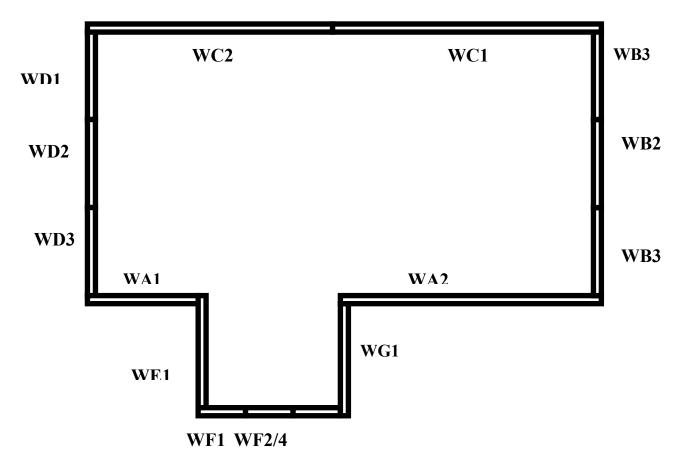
Sedro-Woolley SIP Home: Wall Panel Plan
